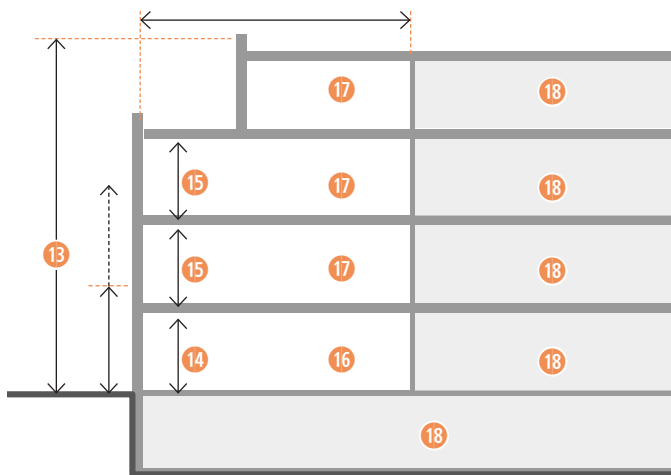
C Workshop/Warehouse Building: Height & Use Requirements
